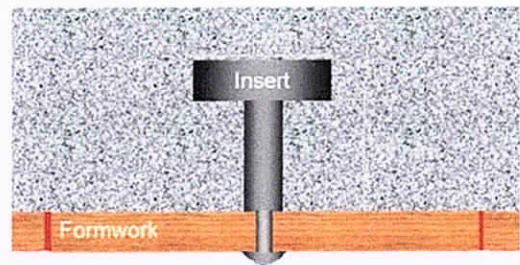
The test bolt (incl. disc and stem) is mounted on the inside of the form prior to placing concrete.
